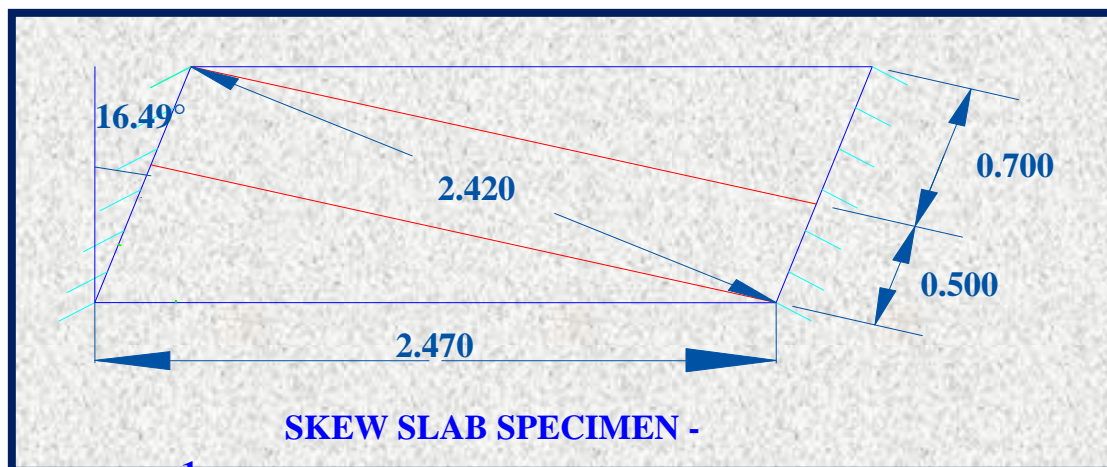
, Skew slab with short diagonal less than span ($L < l$) [(24)]
